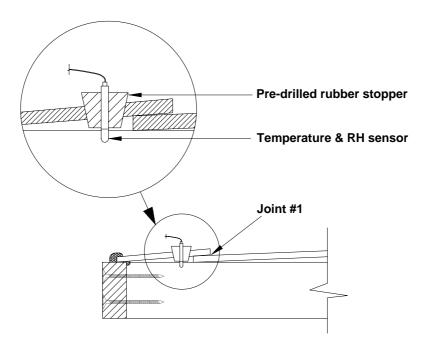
Detail showing the sensor and rubber stopper assembly.
